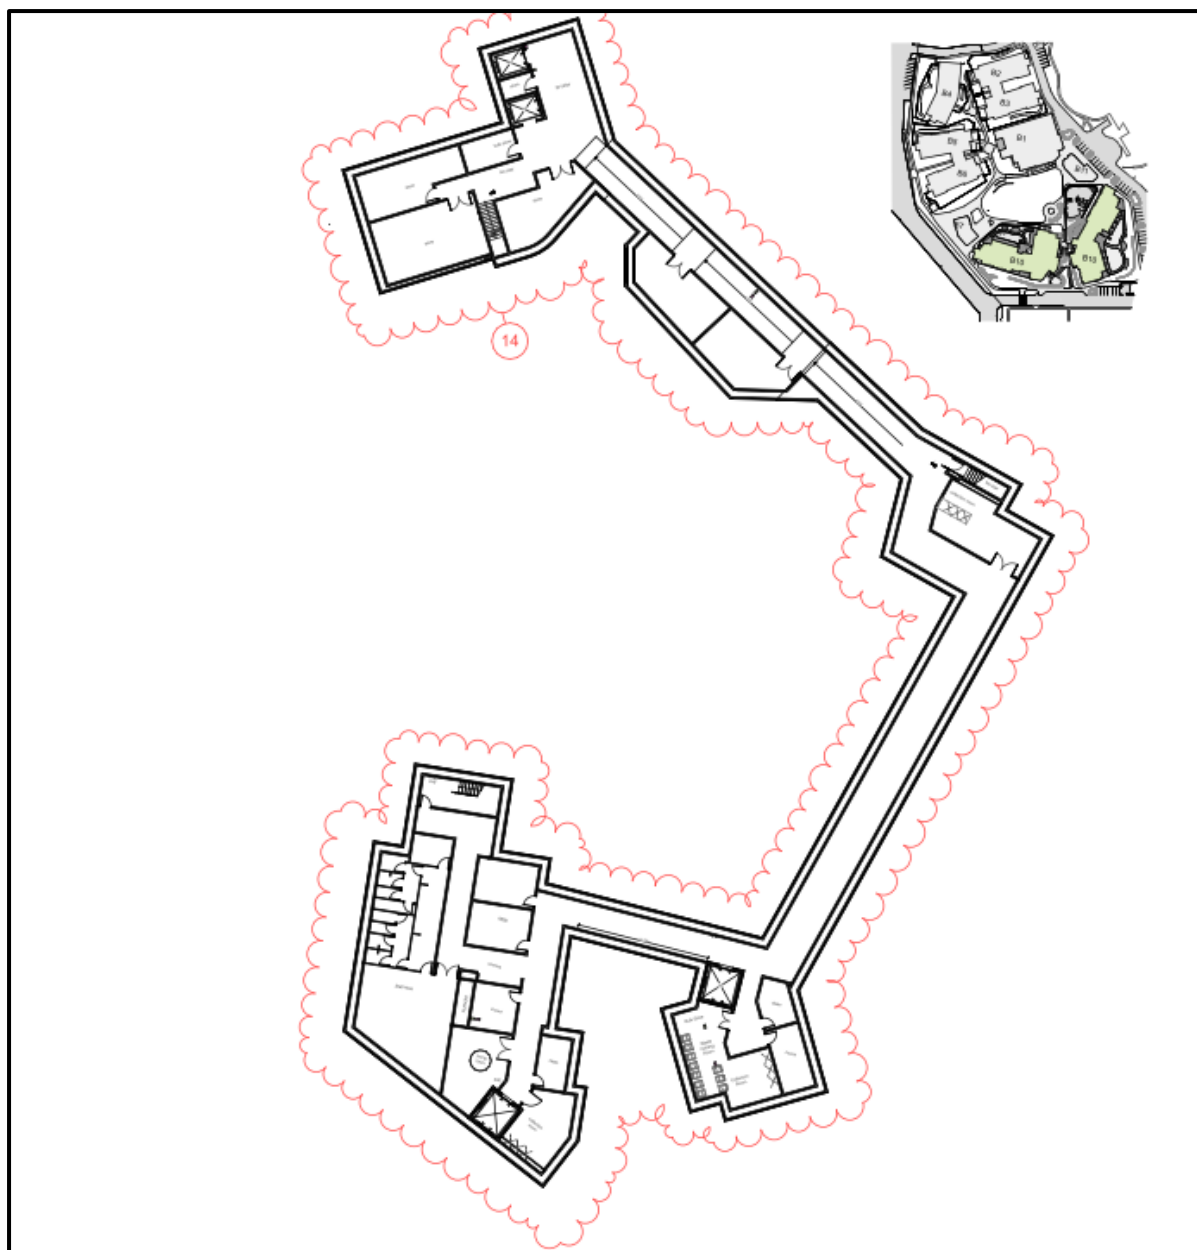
Proposed B10A/B & B1 Basement Plan for Subject Modification C
